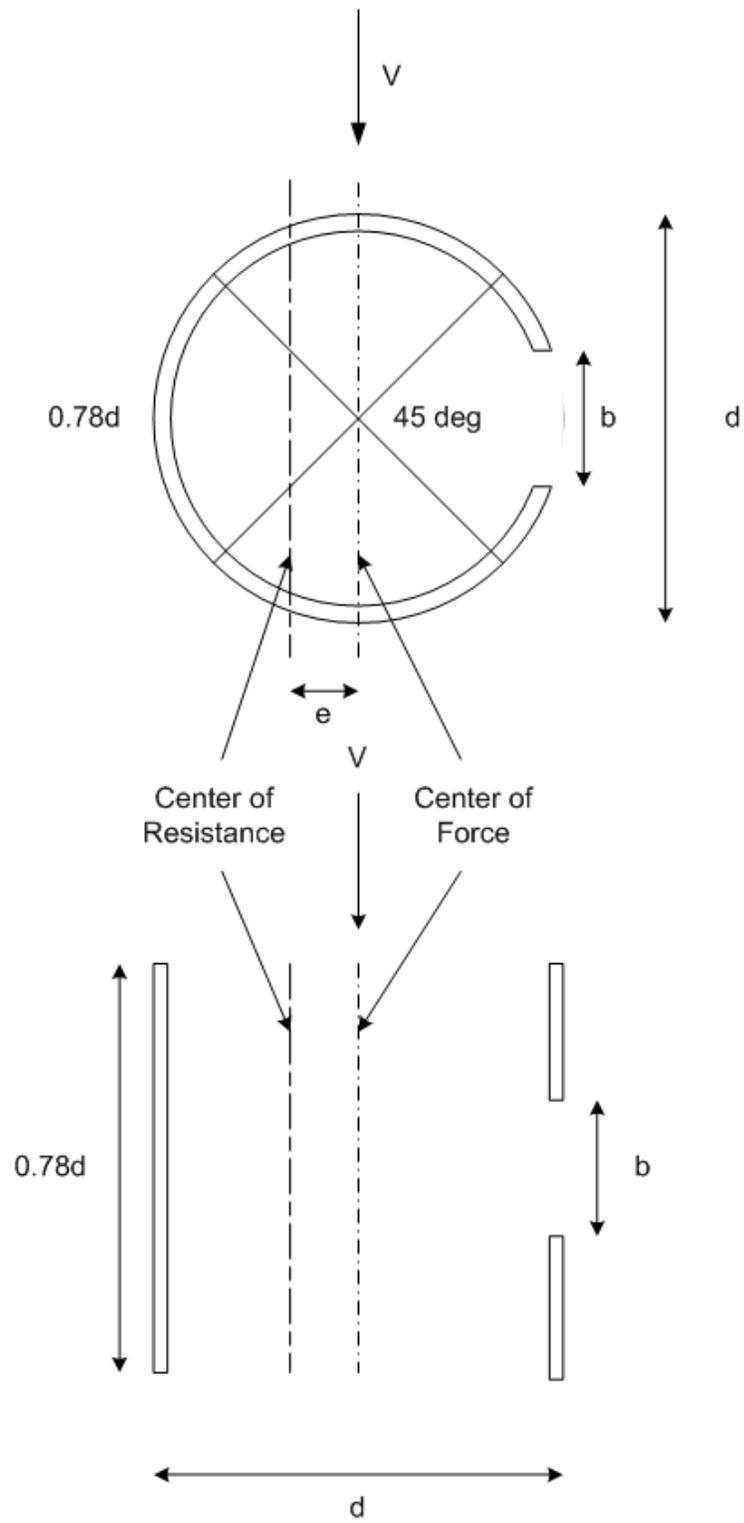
Shear forces distribution diagram in the walls of the pier structure
